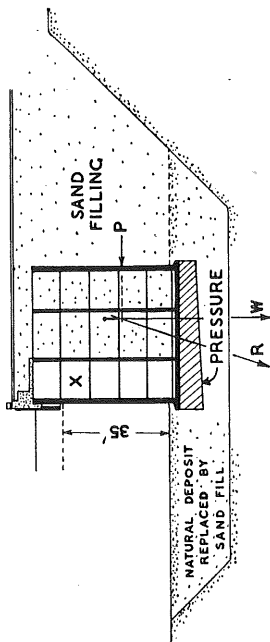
METHOD OF REPLACING AN INFERIOR SUBSOIL TO FOUND BOX CAISSONS FOR A QUAY WALL.
